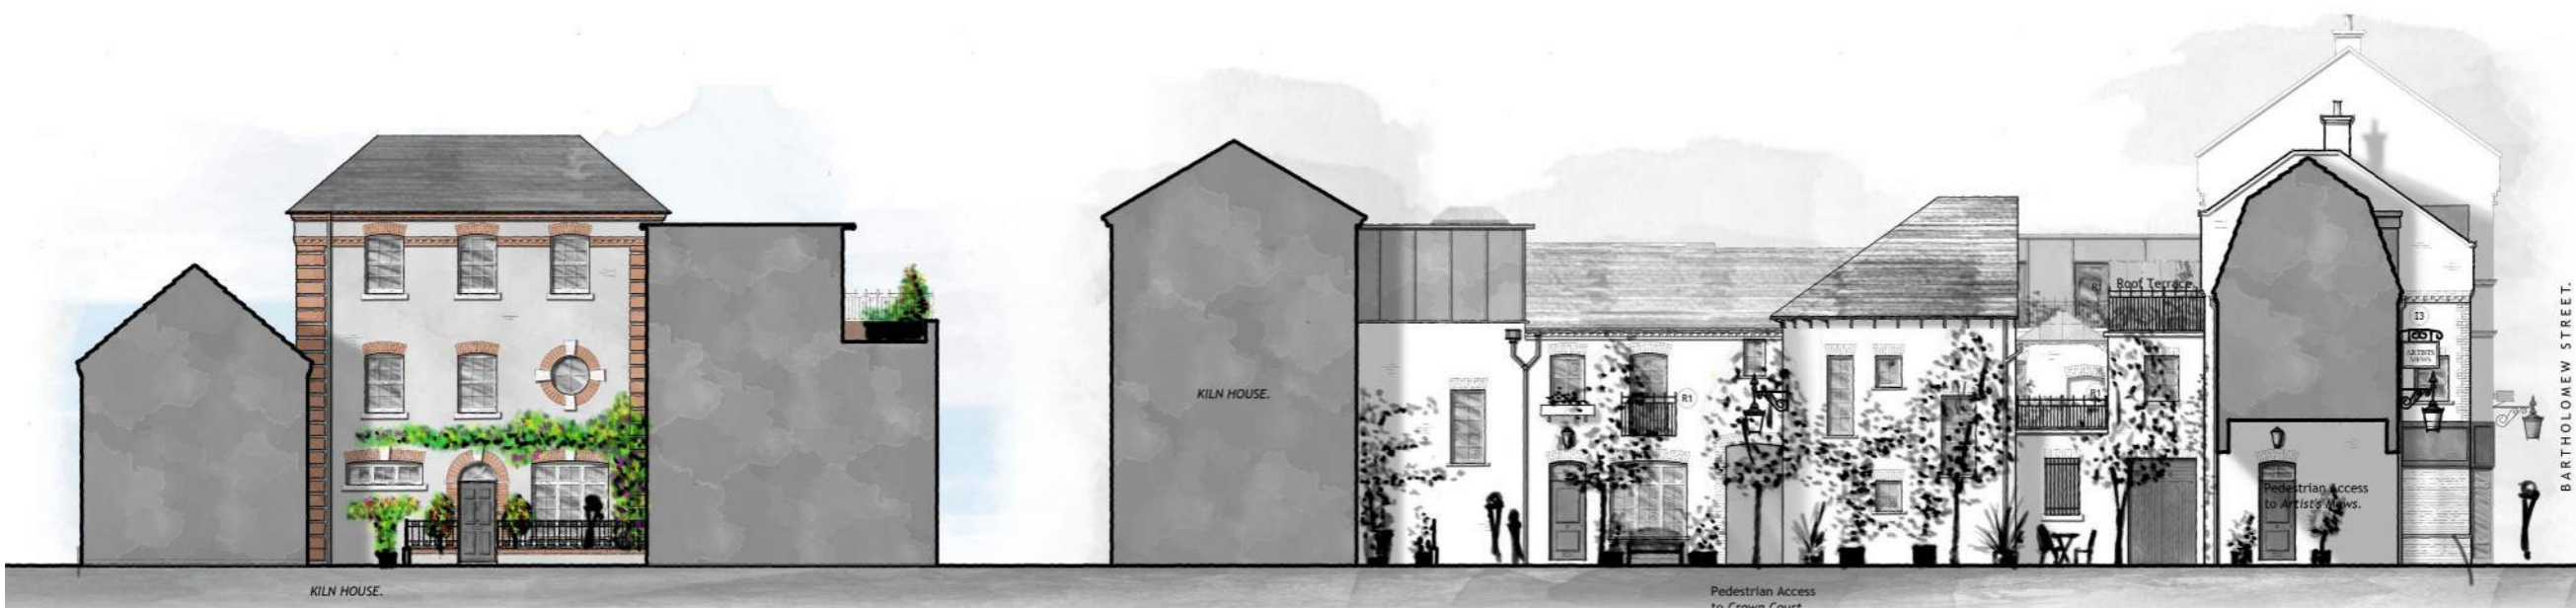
Artist's Mews (North) Elevation (Kiln House).
